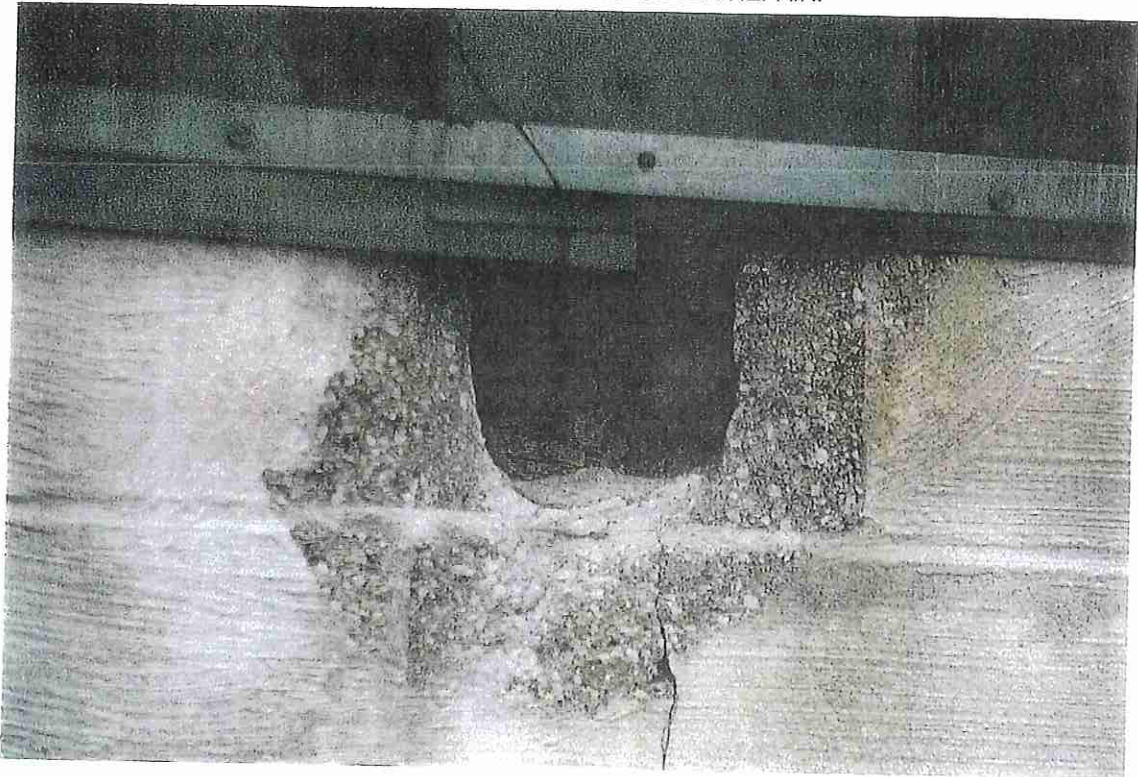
CUT NO. 1 - COPING MAIN ROOF. NOTE FLASHING UNDER COPINGS IS HELD BACK 1" FROM FACE OF BRICK.
